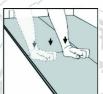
Second plank, second row place the panel at an angle into the groove of the previous row making sure that the end of the plank is tight/flush to the short end of the previous plank. Lengthways tap is required to flush and secure short end join.
